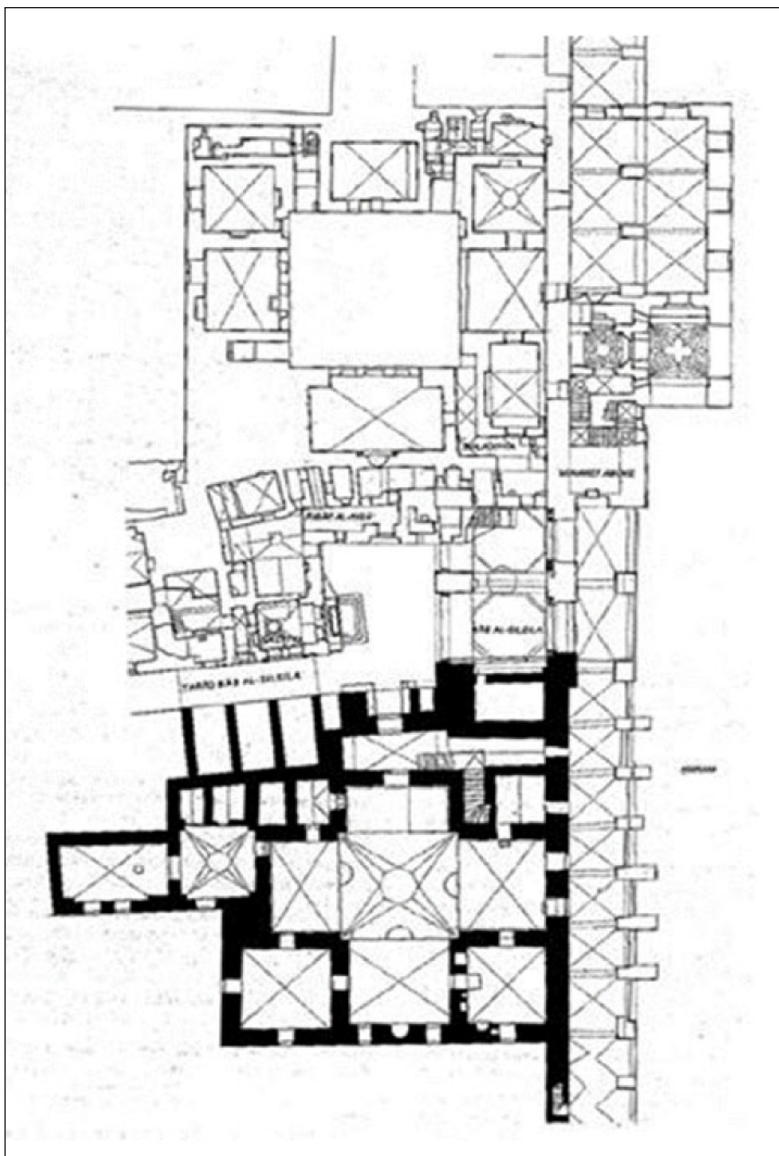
Ground floor plan of the Madrasa al-Tankiziyya.
